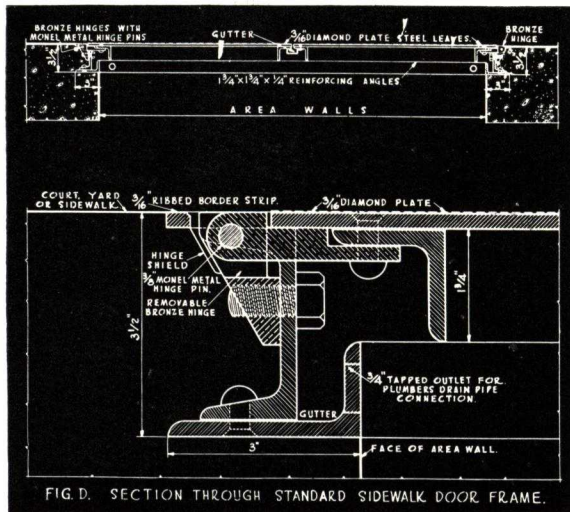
FIG. D. SECTION THROUGH STANDARD SIDEWALK DOOR FRAME.
